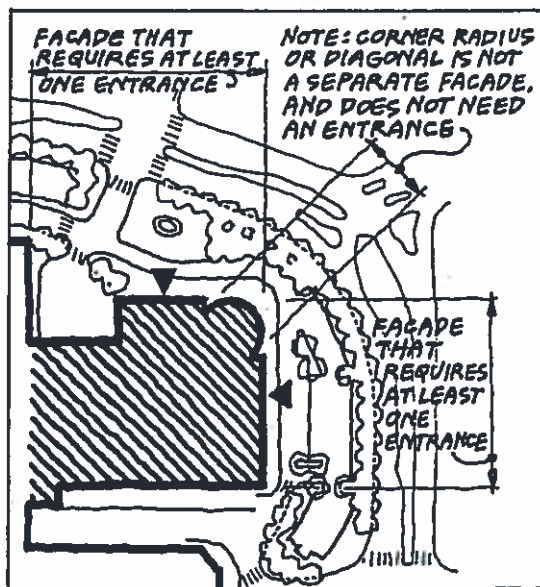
G EXAMPLE OF ONE POSSIBLE ALTERNATIVE WHICH ILLUSTRATES THE 'ENTRY FOR EACH STREET-FACING FAÇADE' REQUIREMENT
